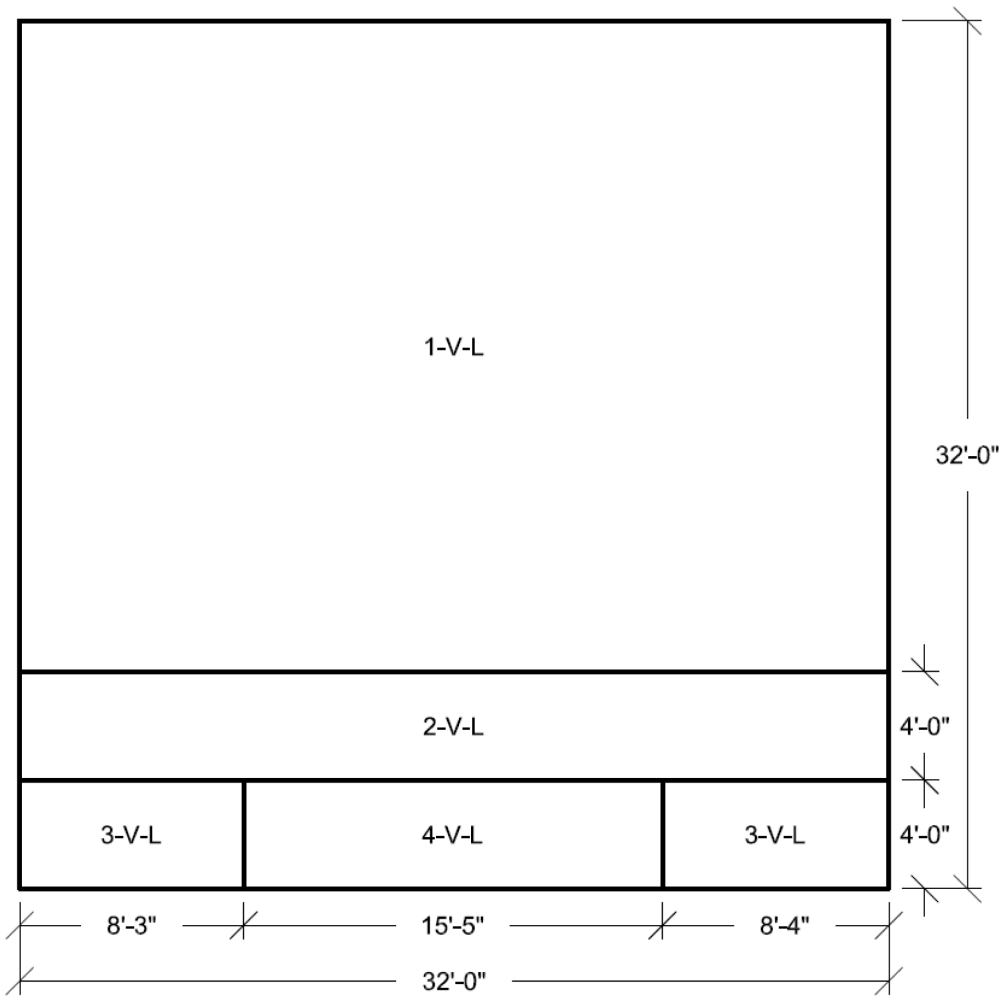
H.6-186 DGFOV Wall 12 Looking From Outside Vertical Reinforcement Zones Near Side Face
